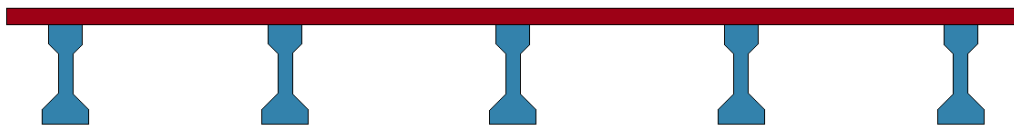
Cross-Sectional View of Archetype 2 Bridge Model.
